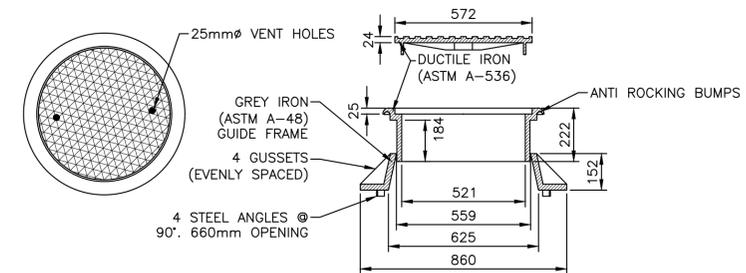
m ϕ SANITARY MANHOLE INSTALLATION
